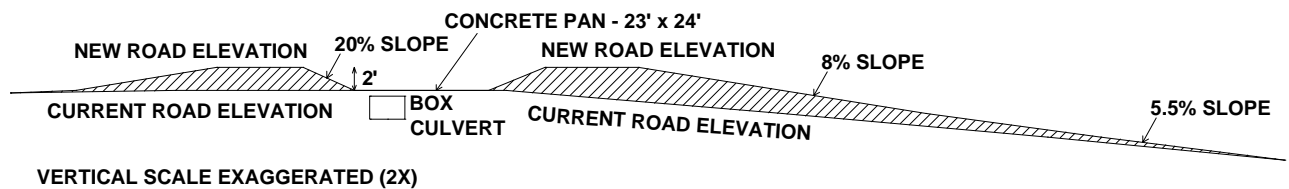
Roadway centerline plan view of Windy Gulch flood overflow
